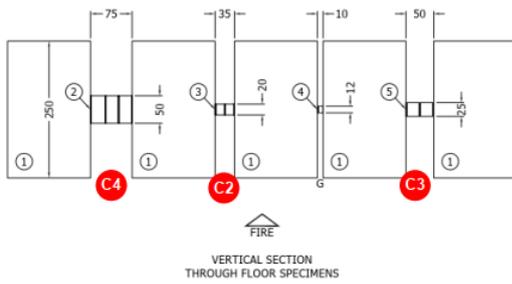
Cross-section of floor linear gap systems C2-C4 – assessment 1 (as shown in WF 160399) – dimensions in mm
